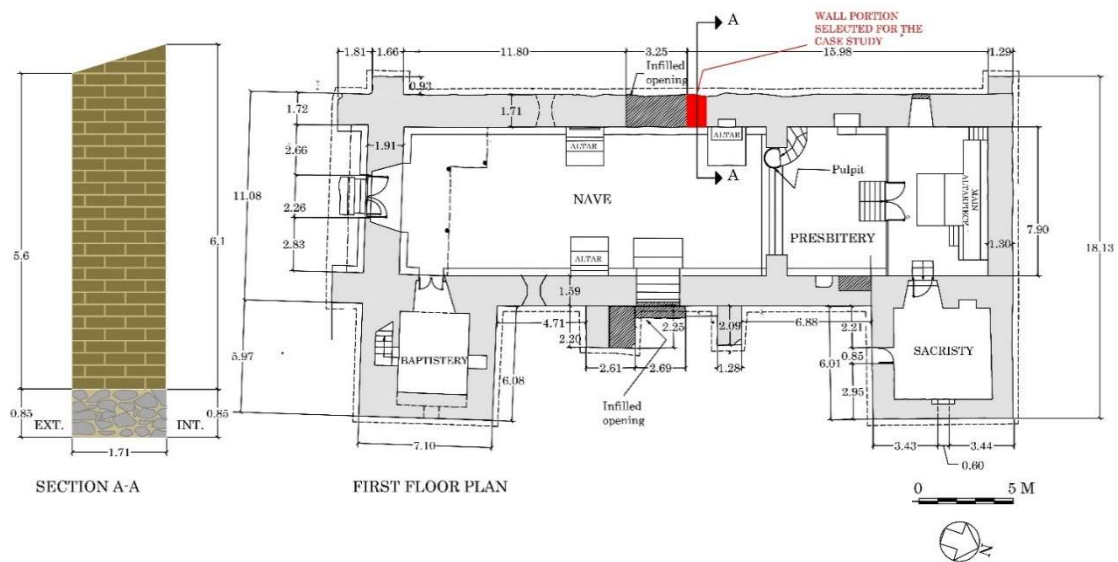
Geometry of the west longitudinal wall. (Dimensions in meters)
